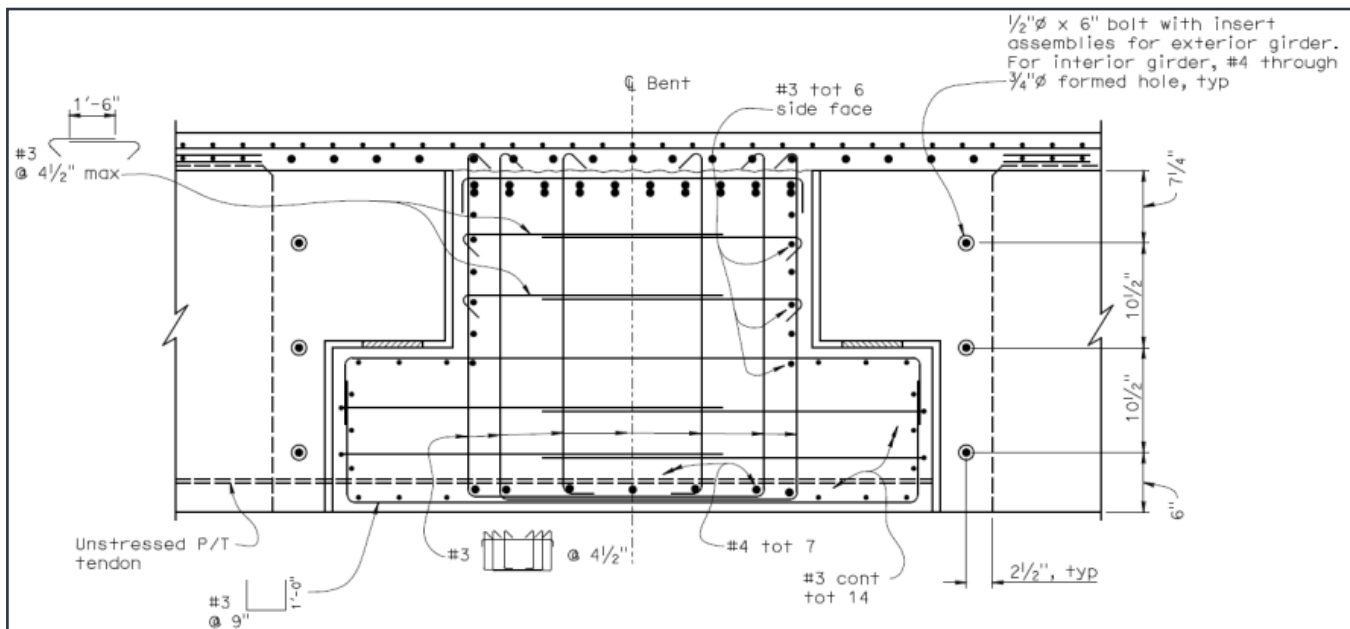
ISU superstructure/cap beam connection with unstressed post-tensioned tendon
